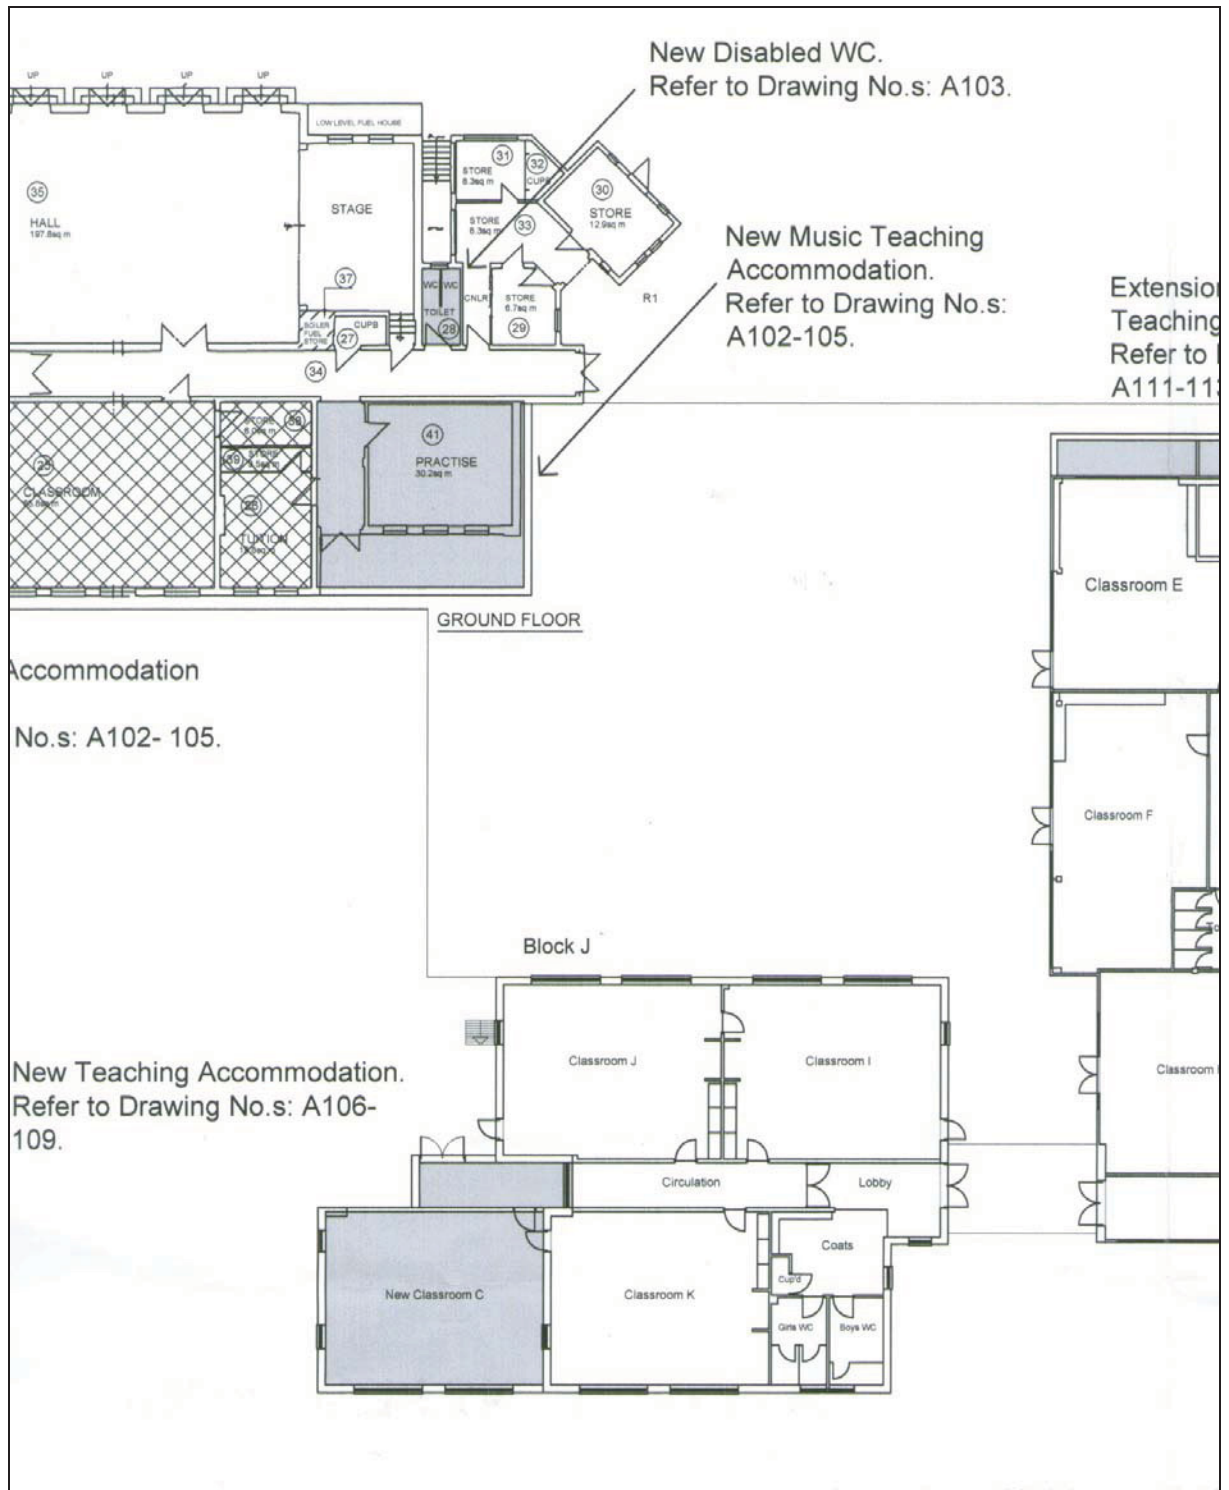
Detail layout of new building extensions (scale 1:200 approx.)
